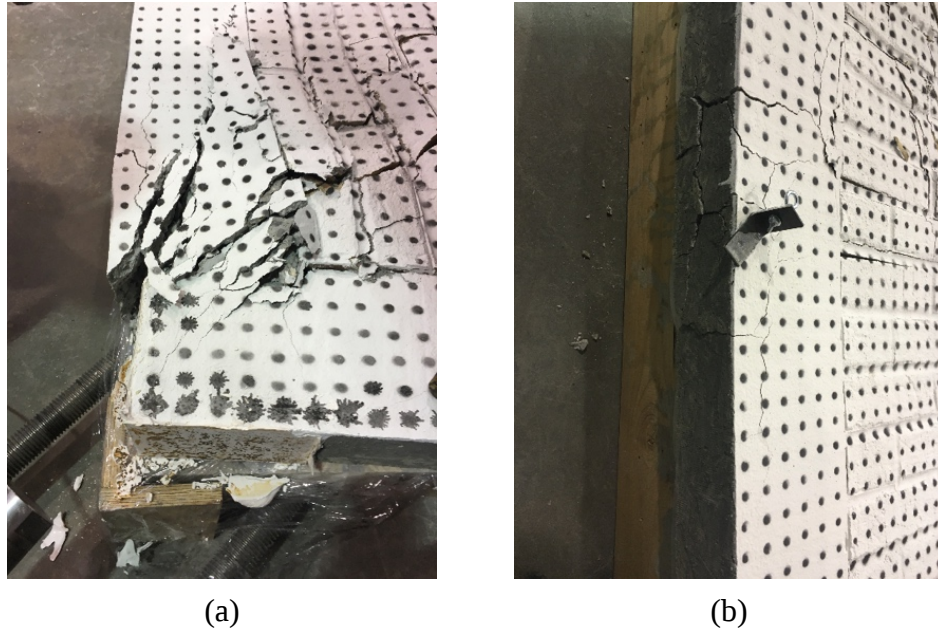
Damage to the concrete confining frame in the masonry infill panel in the form of (a) shear failure of the tie-beam and crushing resulting from failure in the joint and (b) flexural failure of tie-column confining masonry panel
